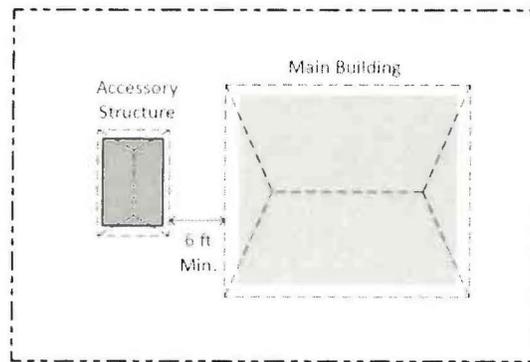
F: ACCESSORY STRUCTURE SEPARATION FROM MAIN BUILDING
